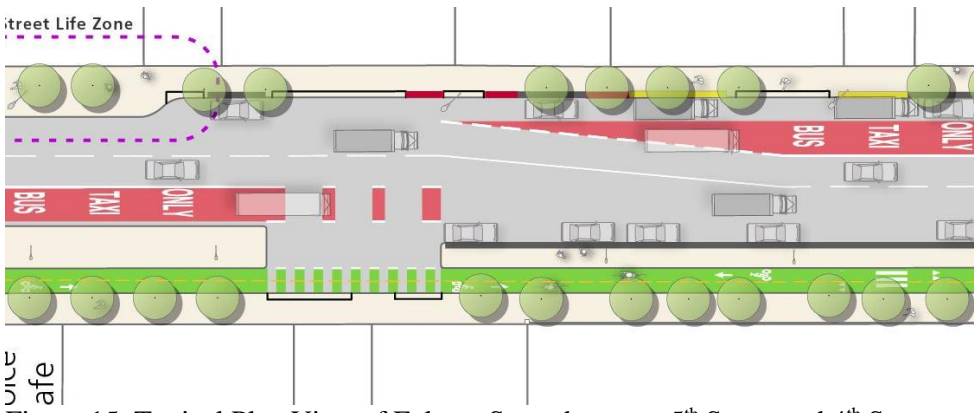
Typical Plan View of Folsom Street between 5th Street and 4th Street
